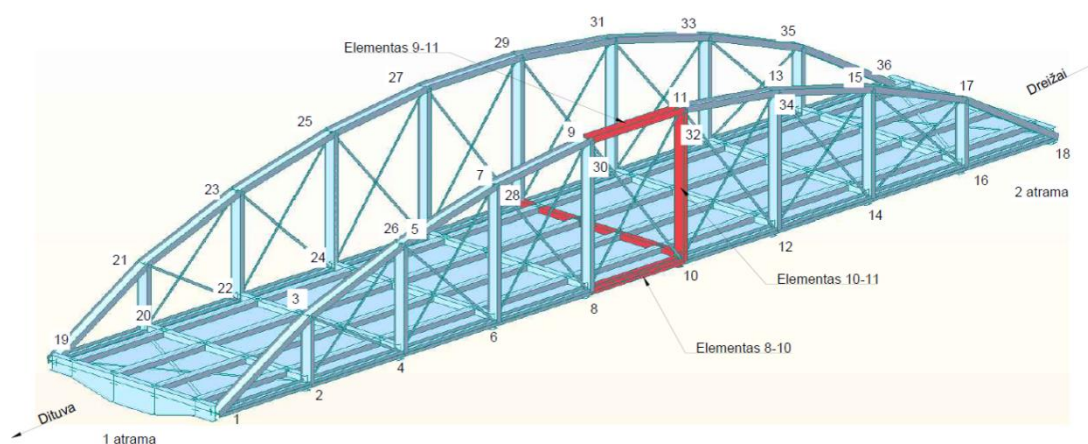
Calculation scheme for the superstructure of the bridge over the river Minija with marked elements
